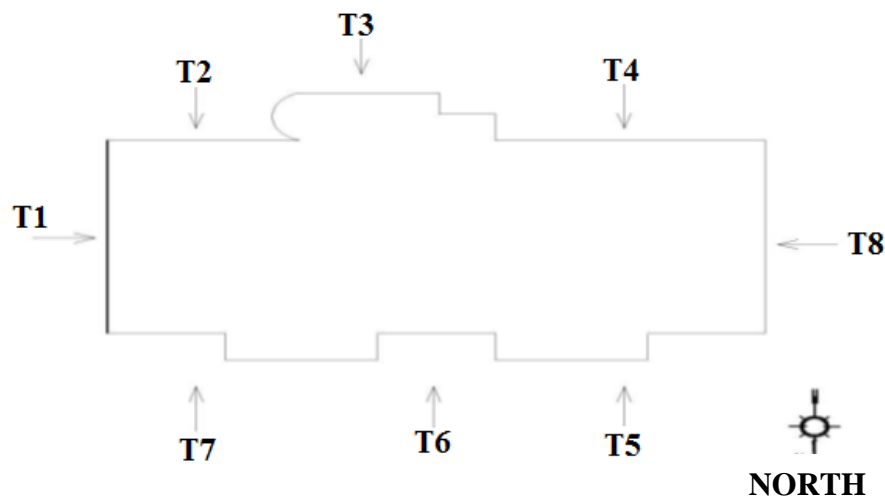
Sketch of building section identifying the facade and its division into sample areas.
